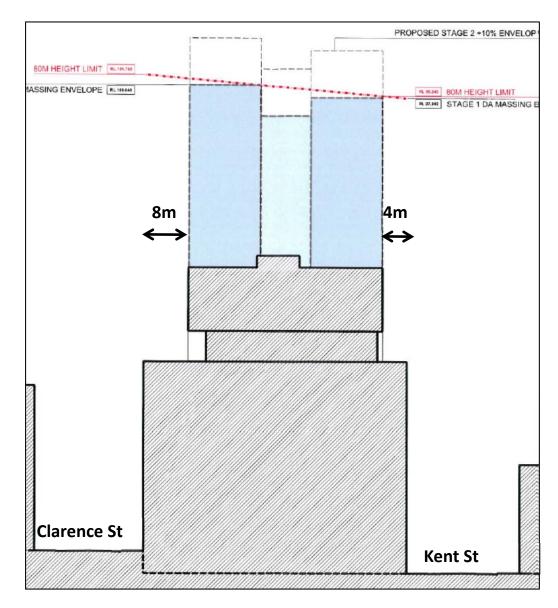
Section of Stage 1 building envelope at 161-165 Clarence Street illustrating approved setbacks above podium/street wall height
